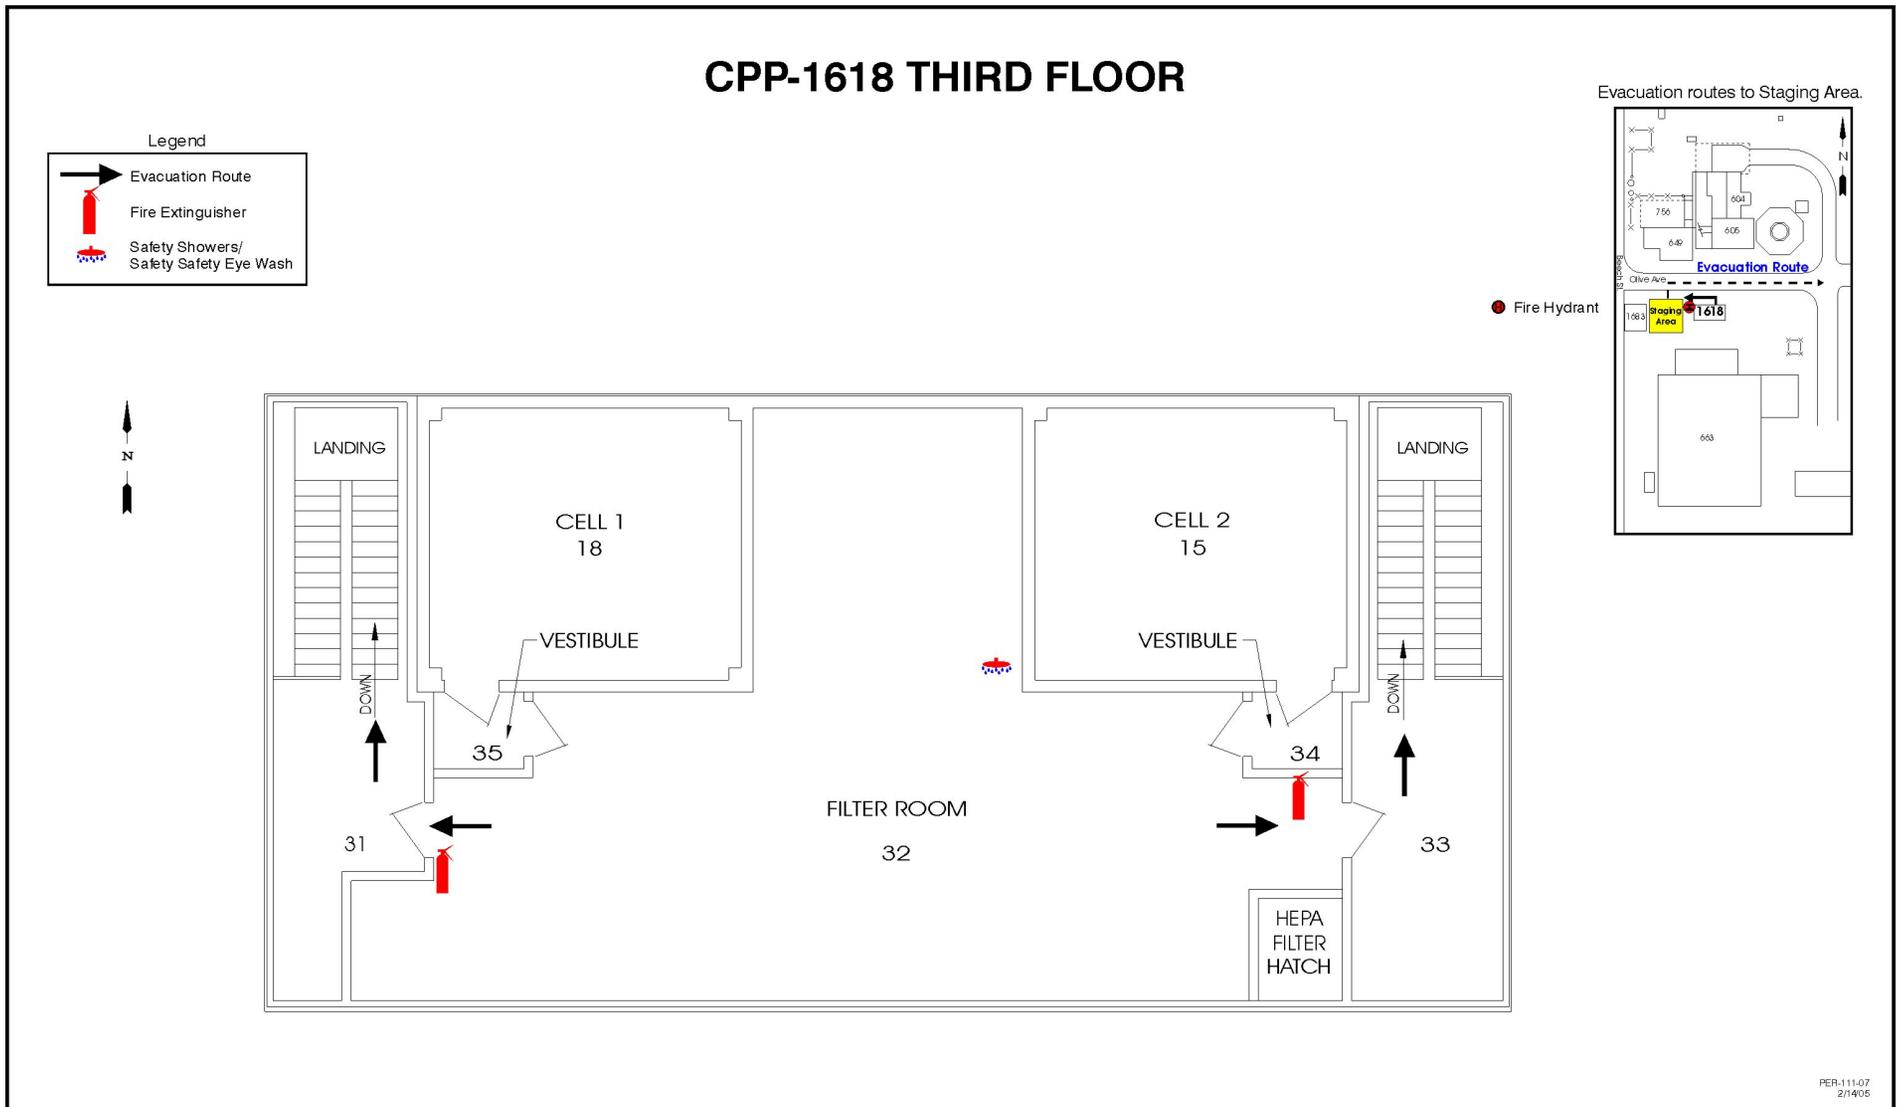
Evacuation Routes and Emergency Equipment, Third Floor CPP-1618
